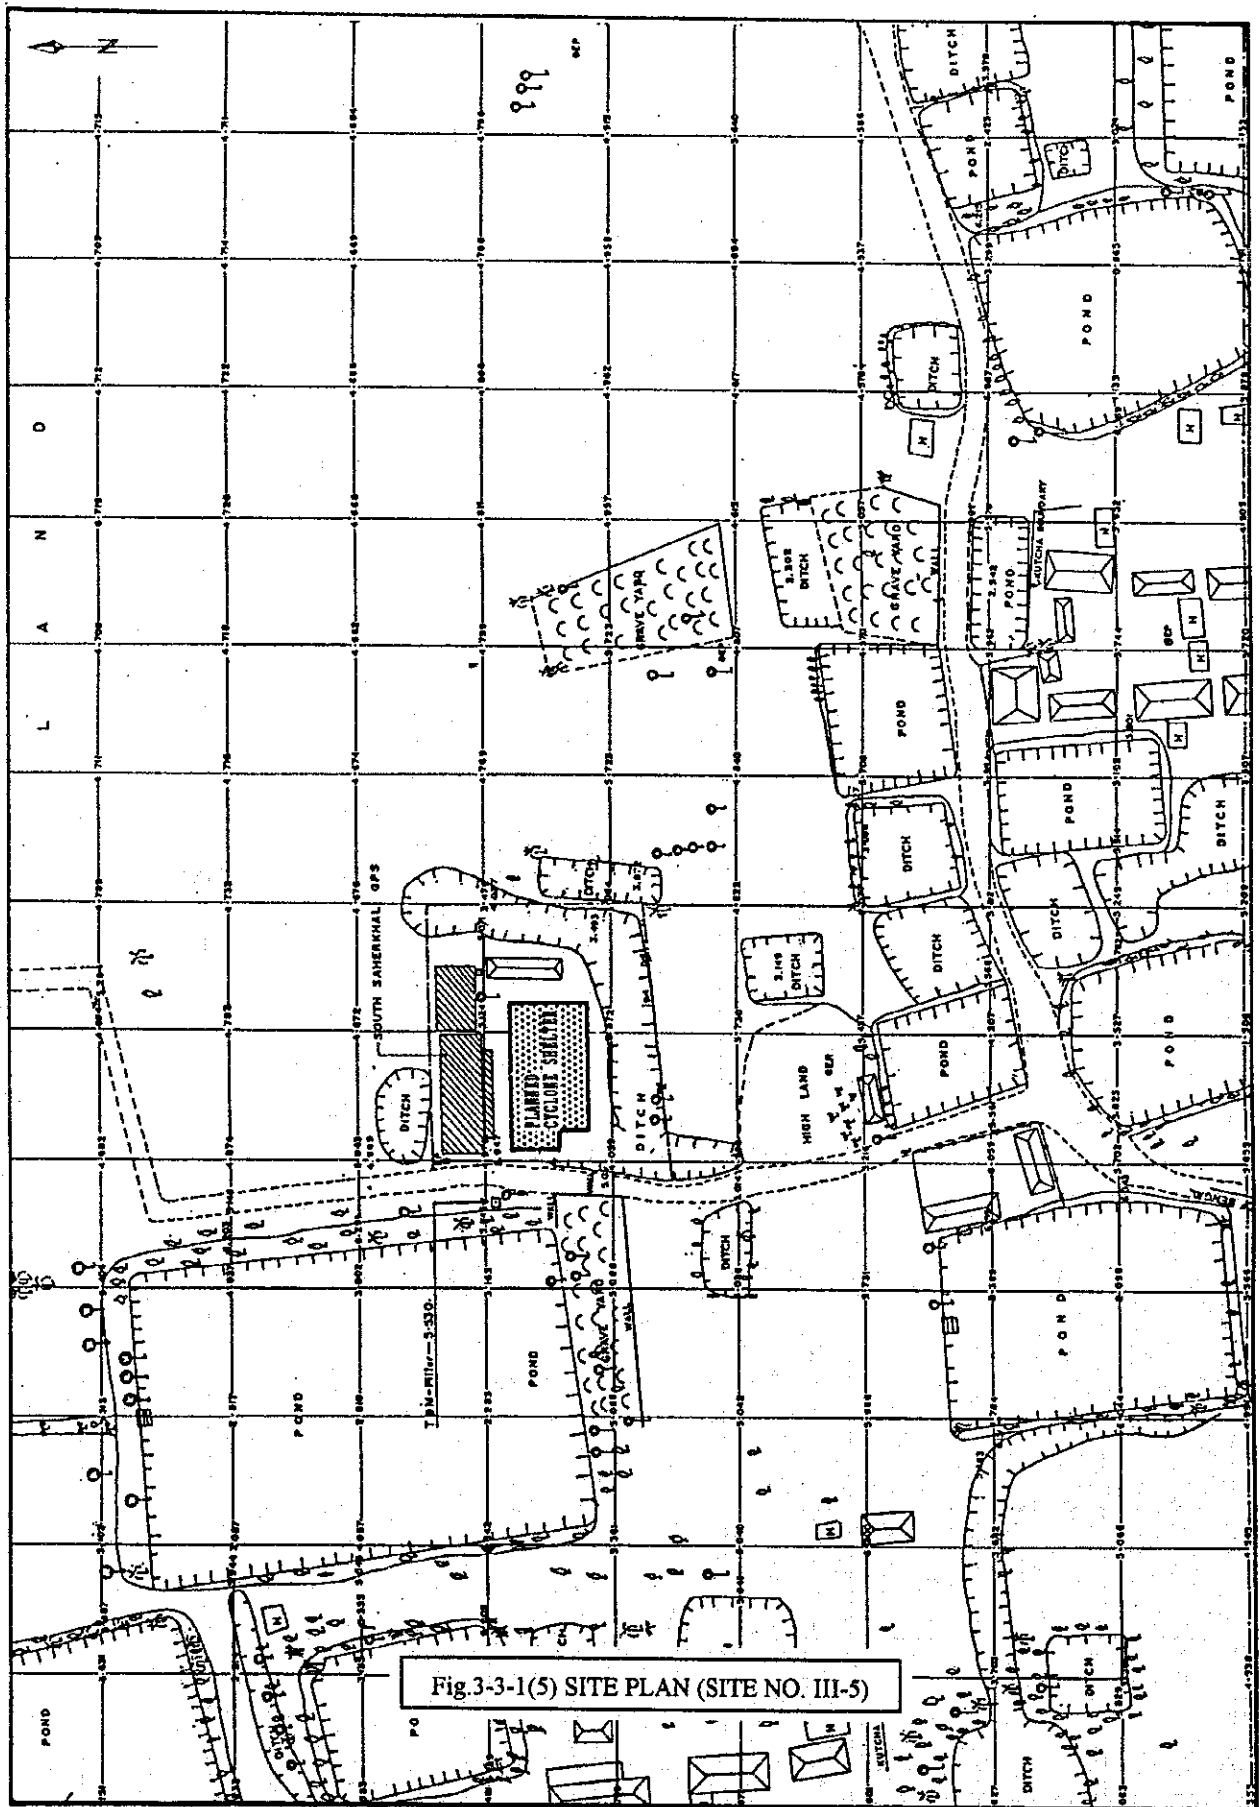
(5) SITE PLAN (SITE NO. III-5)
